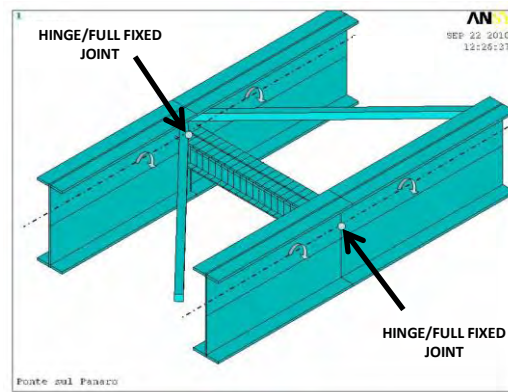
Track bracing cross beam connection to secondary longitudinal girders by full fixed/pin joints
